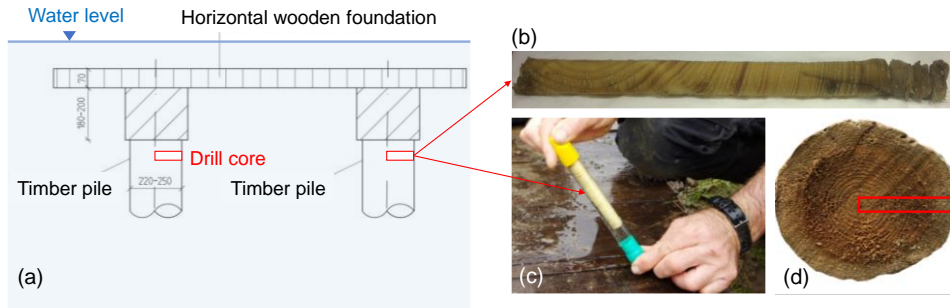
(a) Extraction of a drill core (in red) from the head of a timber foundation pile; (b) drill core; (c) drill core collected in a plastic tube filled with water; (d) cross-sectional view of the wooden pile and extraction depth of the drill core (in red).
